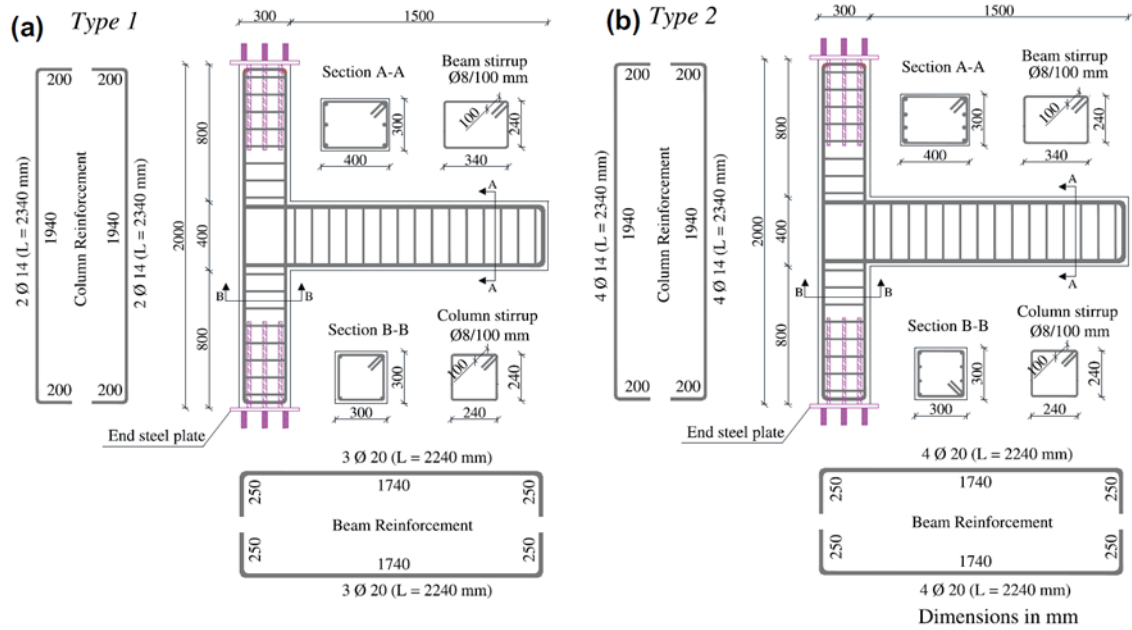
Reinforcement detailing of specimens Type 1 and Type 2[18]
